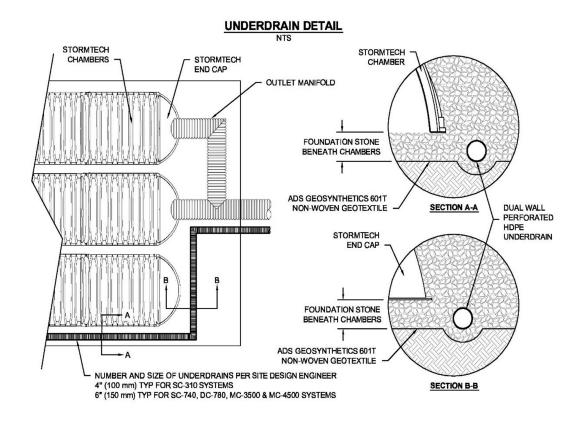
Typical underdrain detail of ADS Stormtech[©] detention structure
